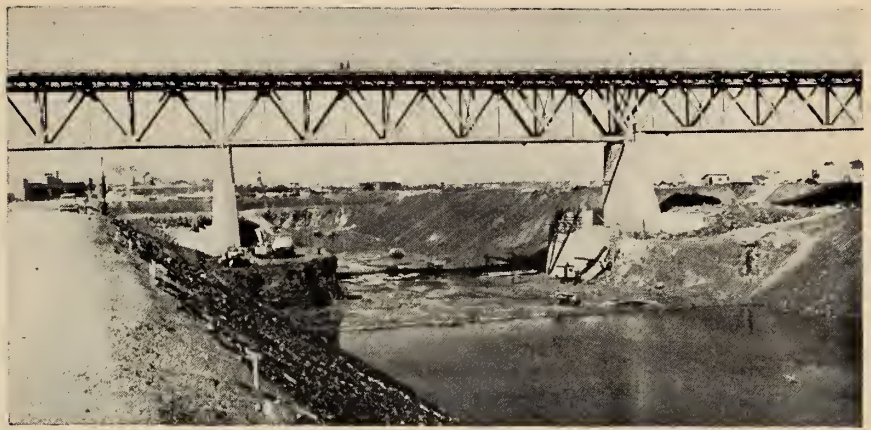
Jacques Cartier bridge. Third stage of channel excavation with three steps of concrete completed at pier 9.
